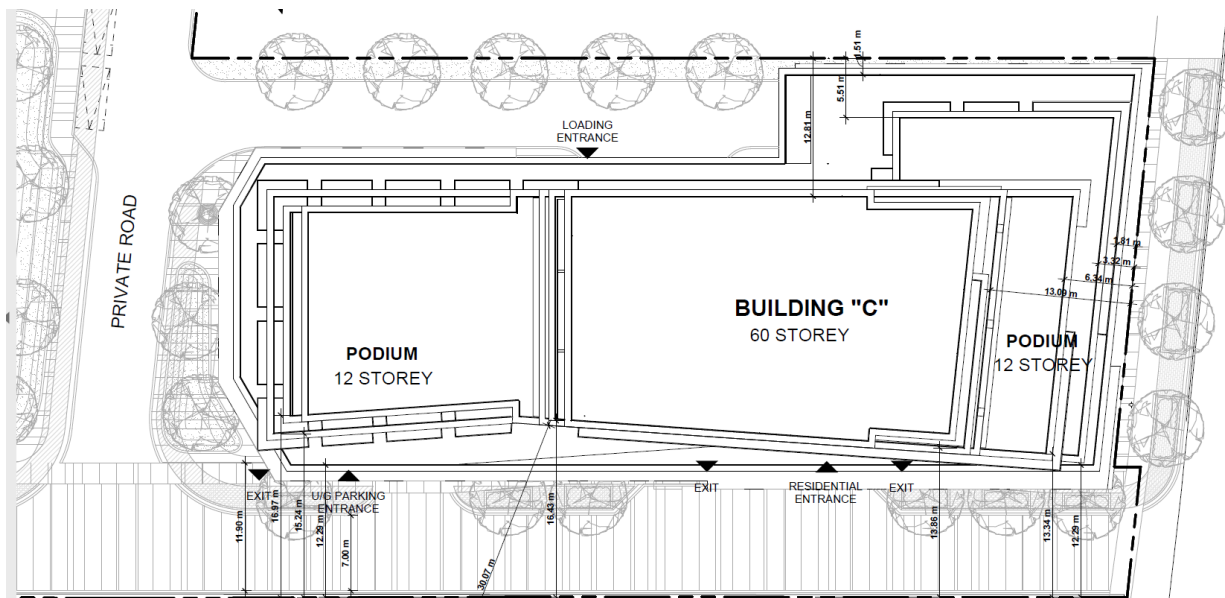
Site Setbacks – Building C (Source: Architectural Drawings, p. 7)
